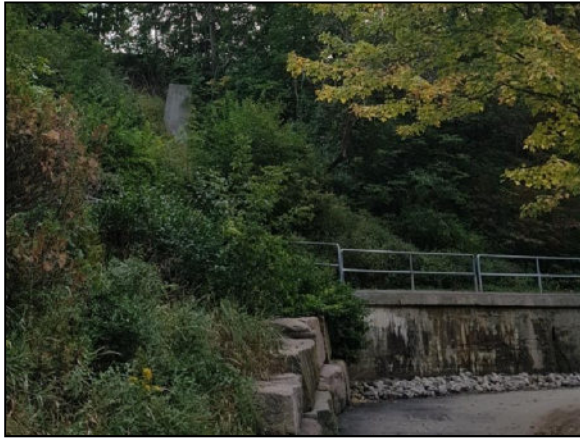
Elevated walkway and single concrete pier on ravine slope.
